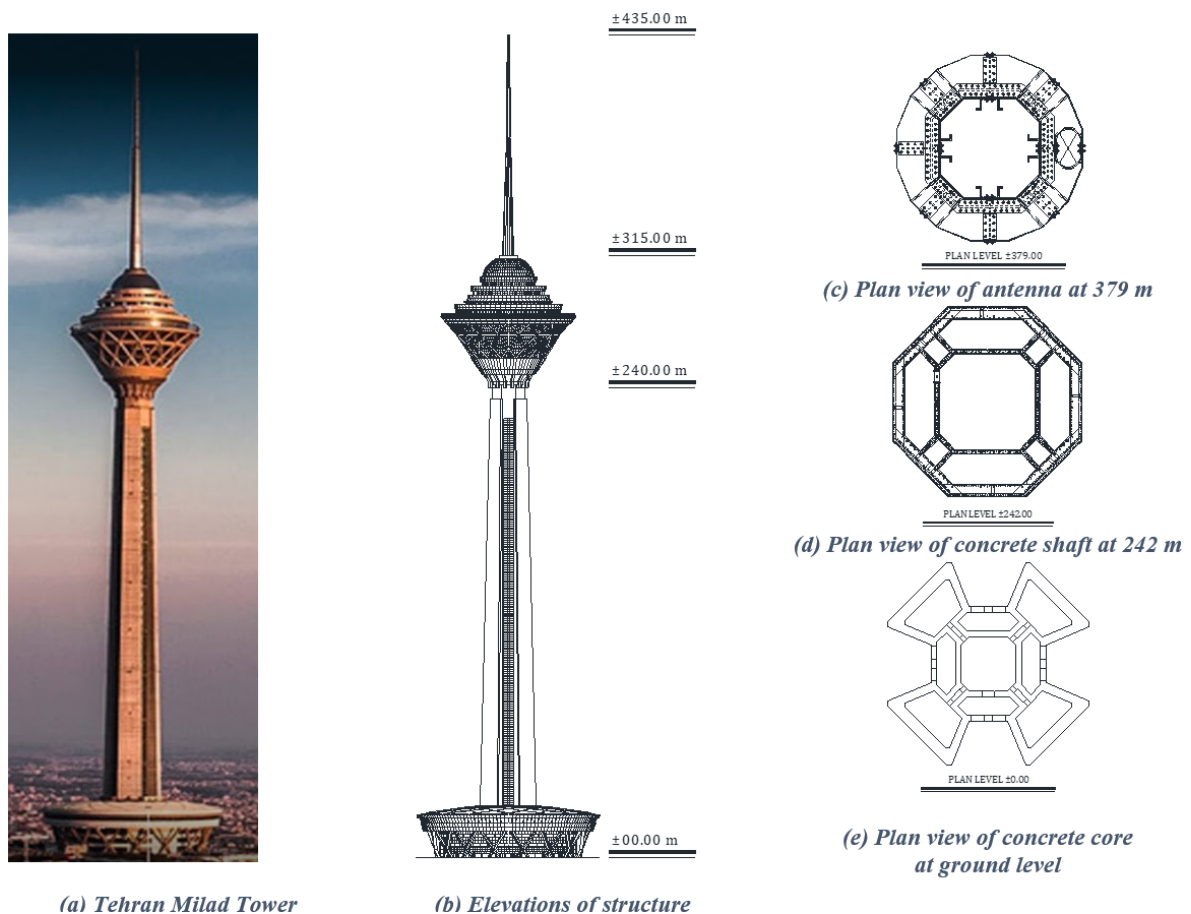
Elevations of Milad Tower and plan sections of concrete core at various levels.
